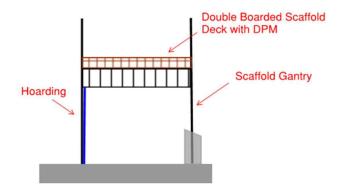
Typical Protected Pedestrian Tunnel (Not to Scale)
